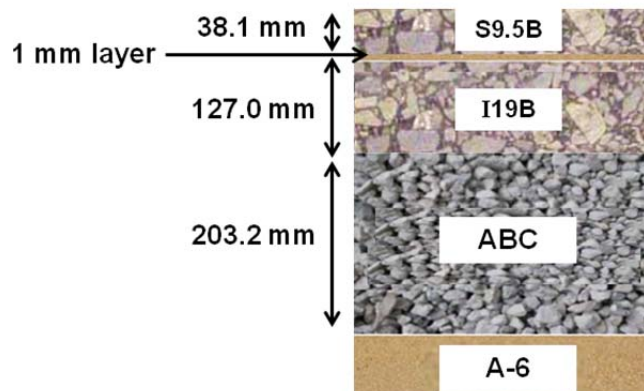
Cross-section of pavement structure with a debonded surface layer.
